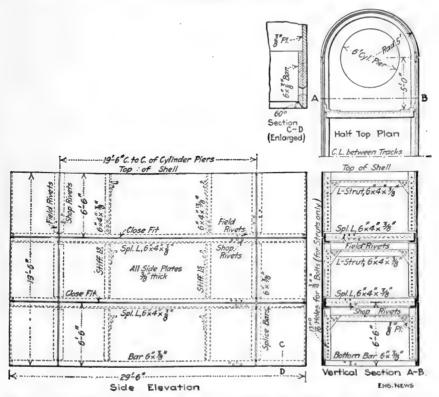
Steel Shell for Base of Cylinder Piers of the Oxford Mill Pond Bridge, Chicago & Northwestern Railway.
